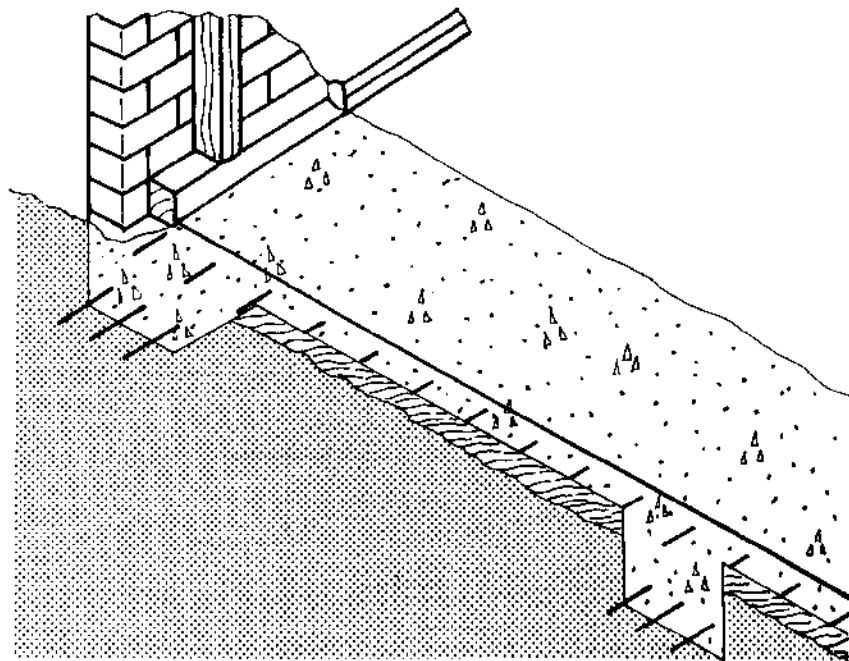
STIFFENED RAFT CONSTRUCTION
